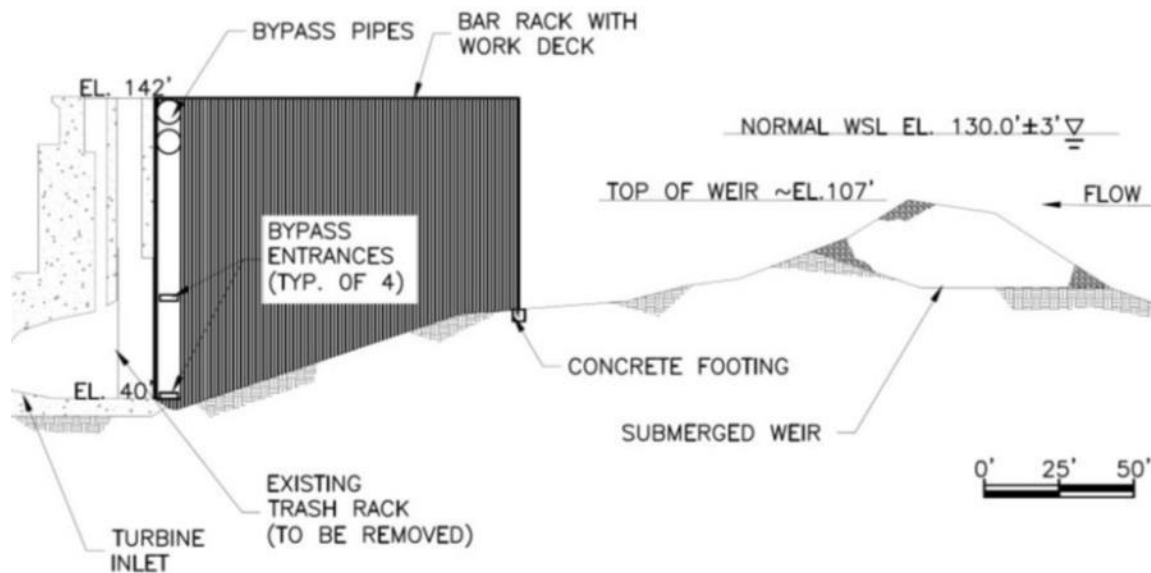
Conceptual design of an angled bar rack installed at Roanoke Rapids (section view).
